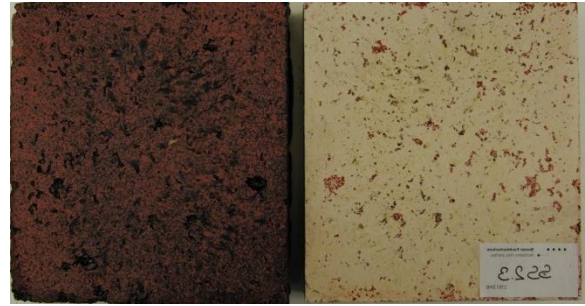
Brittle failure of the shear connection of the LSS sealant on a steel deck
